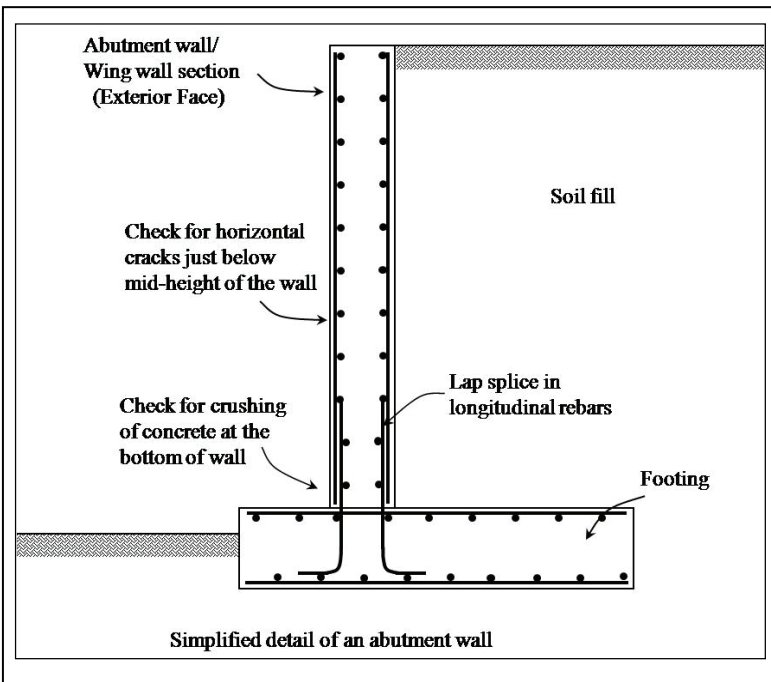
Typical Cross Section of an Abutment/Wing-wall, (Aboutaha, 2004)
